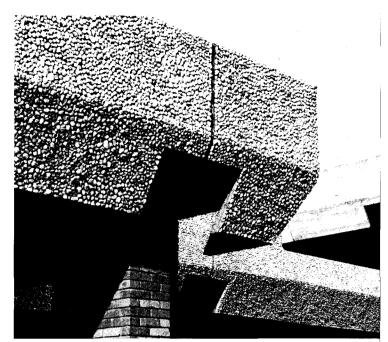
Pebble dash finish on concrete roof fascia, C.S.I.R. building (under construction), Library Accra. Architect: V. MAHADEVAN.
